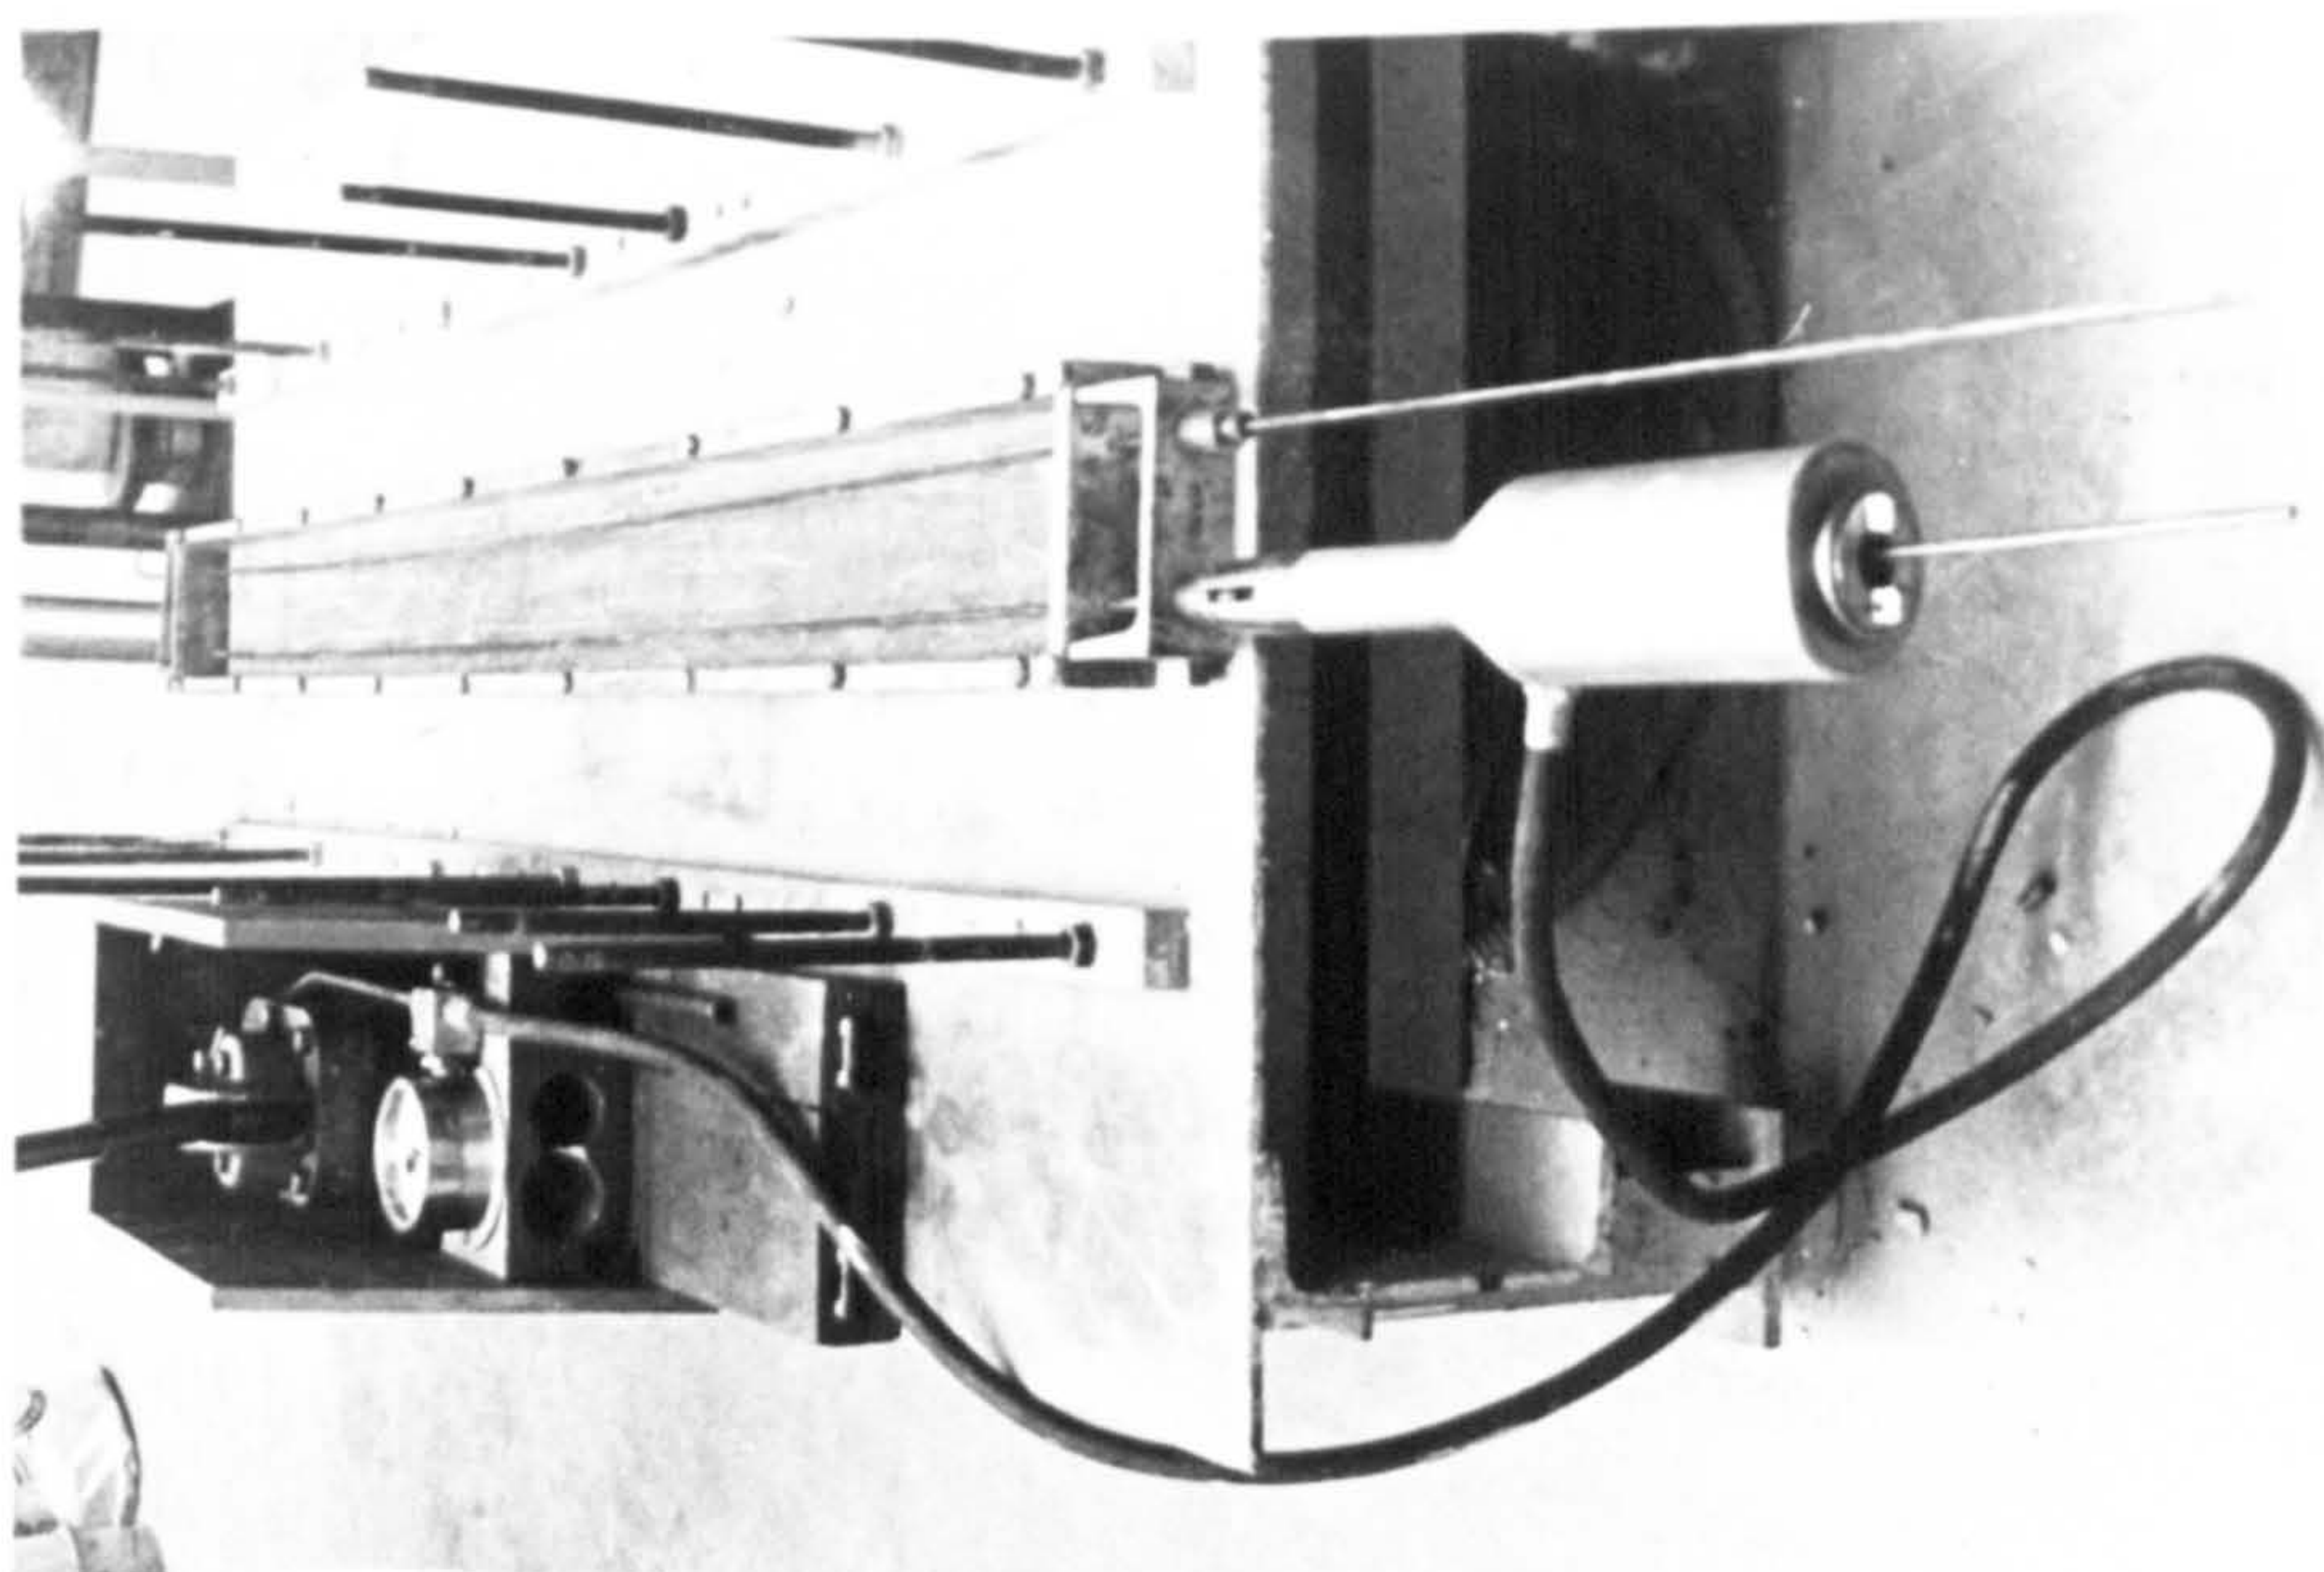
Plank rigid steel mould and the pump operating the hydraulic jack
